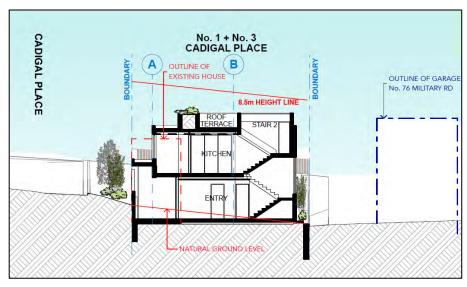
Section B demonstrating the height of the proposal (including roof terrace and planter box) towards the front of the dwelling.
